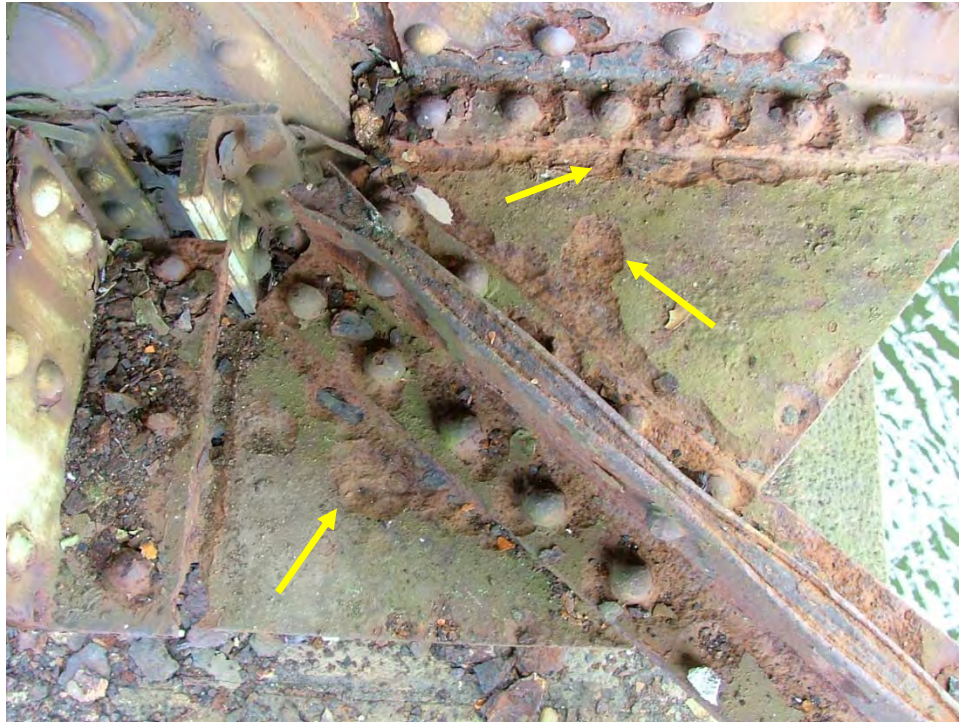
Span 1, typical bottom lateral bracing gusset plate condition with moderate pitting and corrosion.
